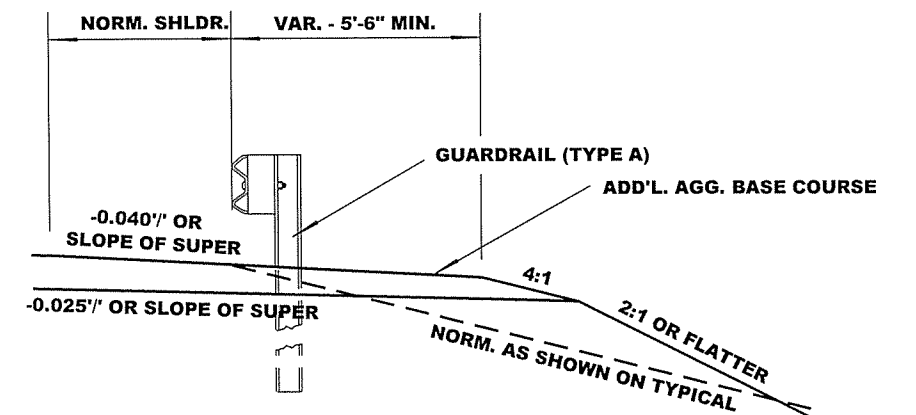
DETAILS OF WIDENING FOR GUARDRAIL (28'-0" CLEAR ROADWAY CAST IN PLACE BRIDGE)
